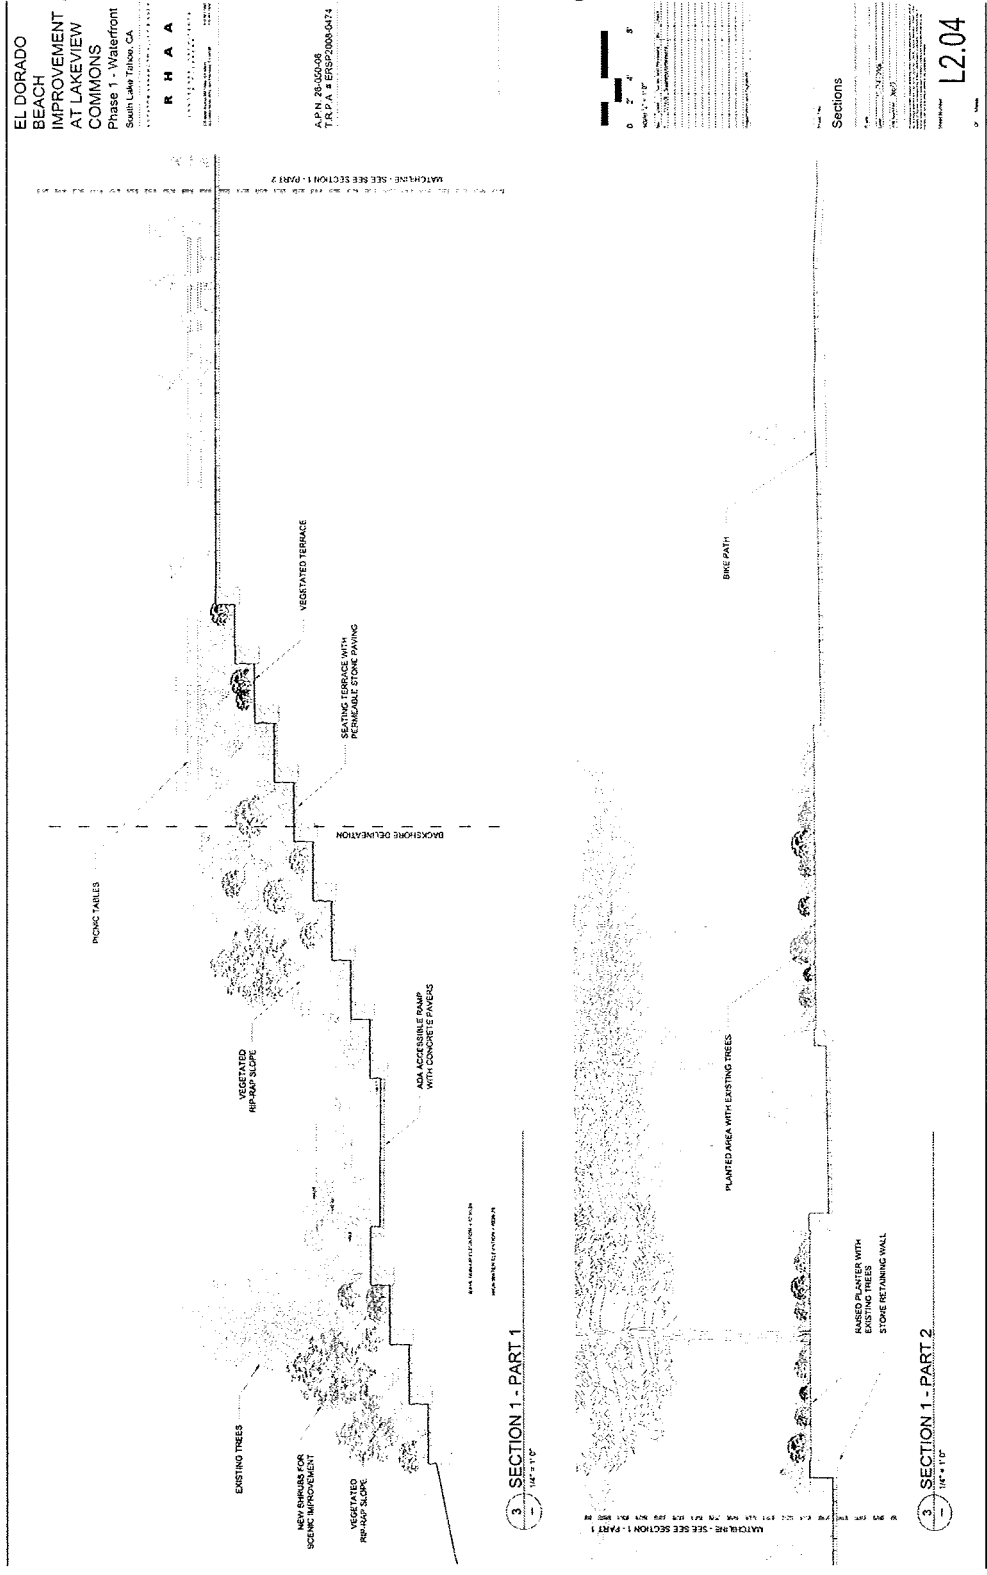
Landscape Construction Plan Section at Planted Terrace
